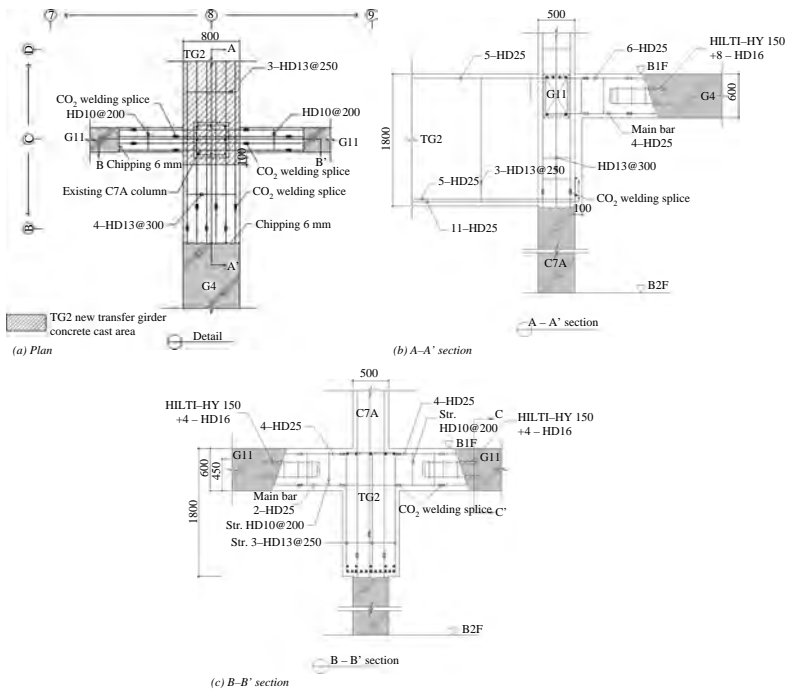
Joint detail of adding new transfer girder (Units: mm)
